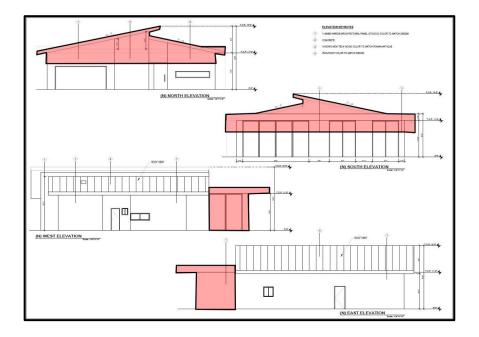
Elevation of proposed development with roof and rear additions shown in red
